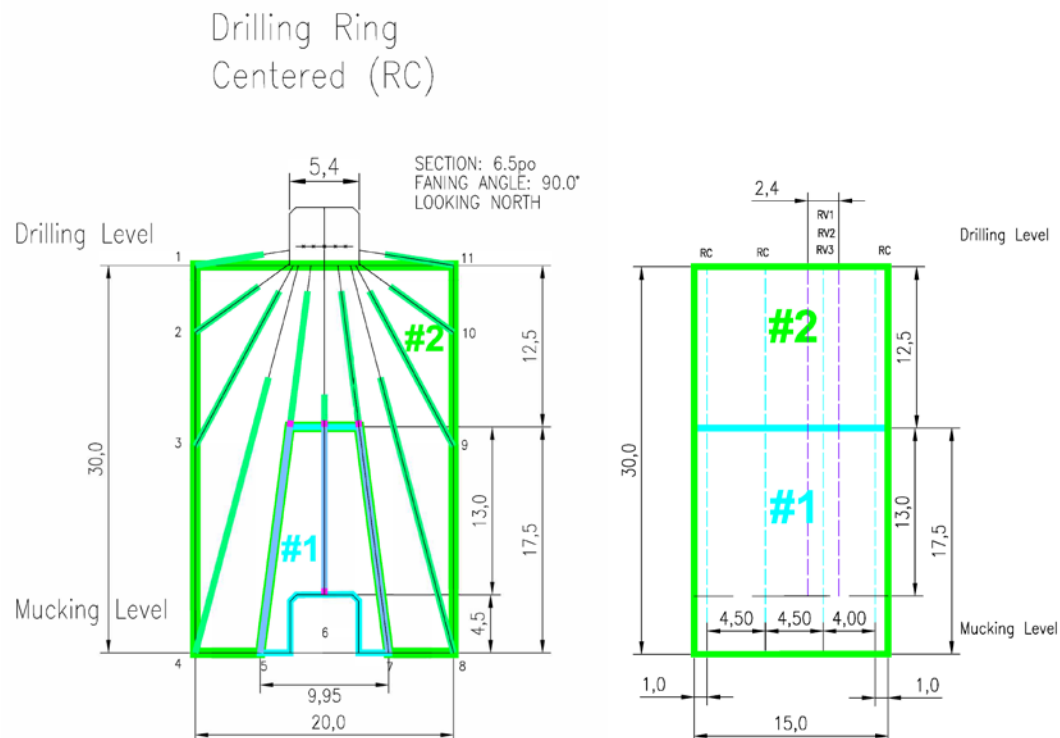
Typical drilling and blasting pattern for levels L1340 to L1880
